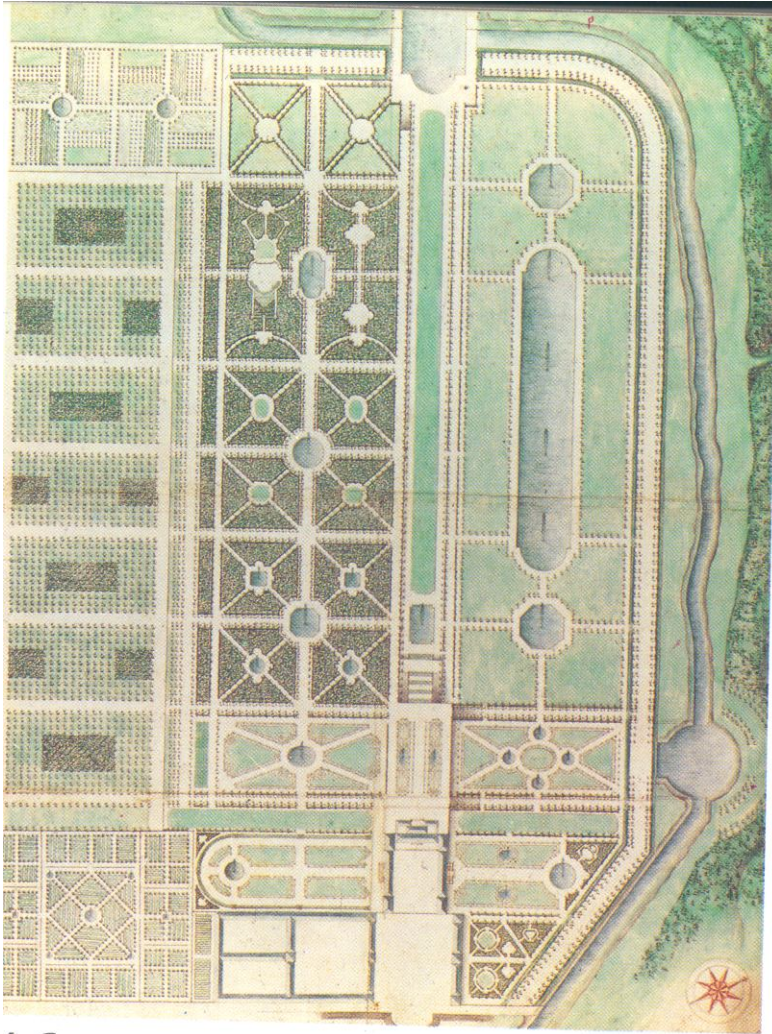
Plan of the new garden in French style at Venaria Reale, 1700 c.
